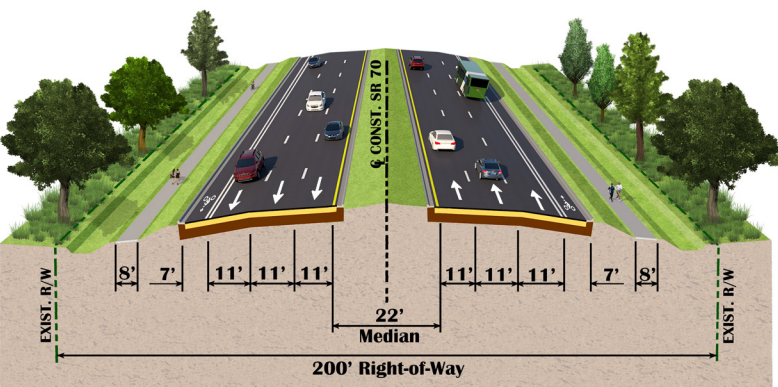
Lorraine Road to East of Greenbrook Boulevard
